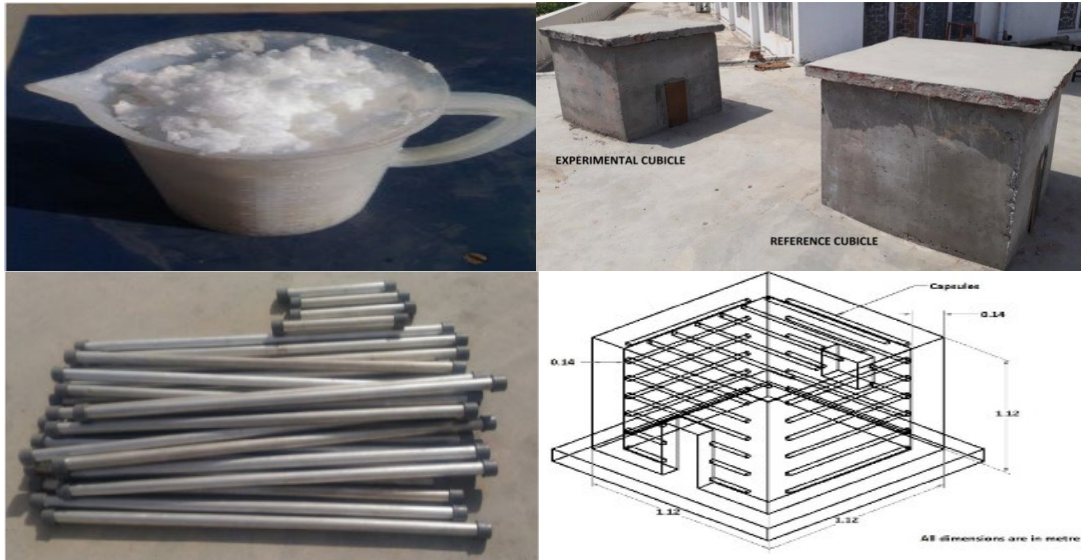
Steps for installing PCM in pipes and then in the building envelope [74].
